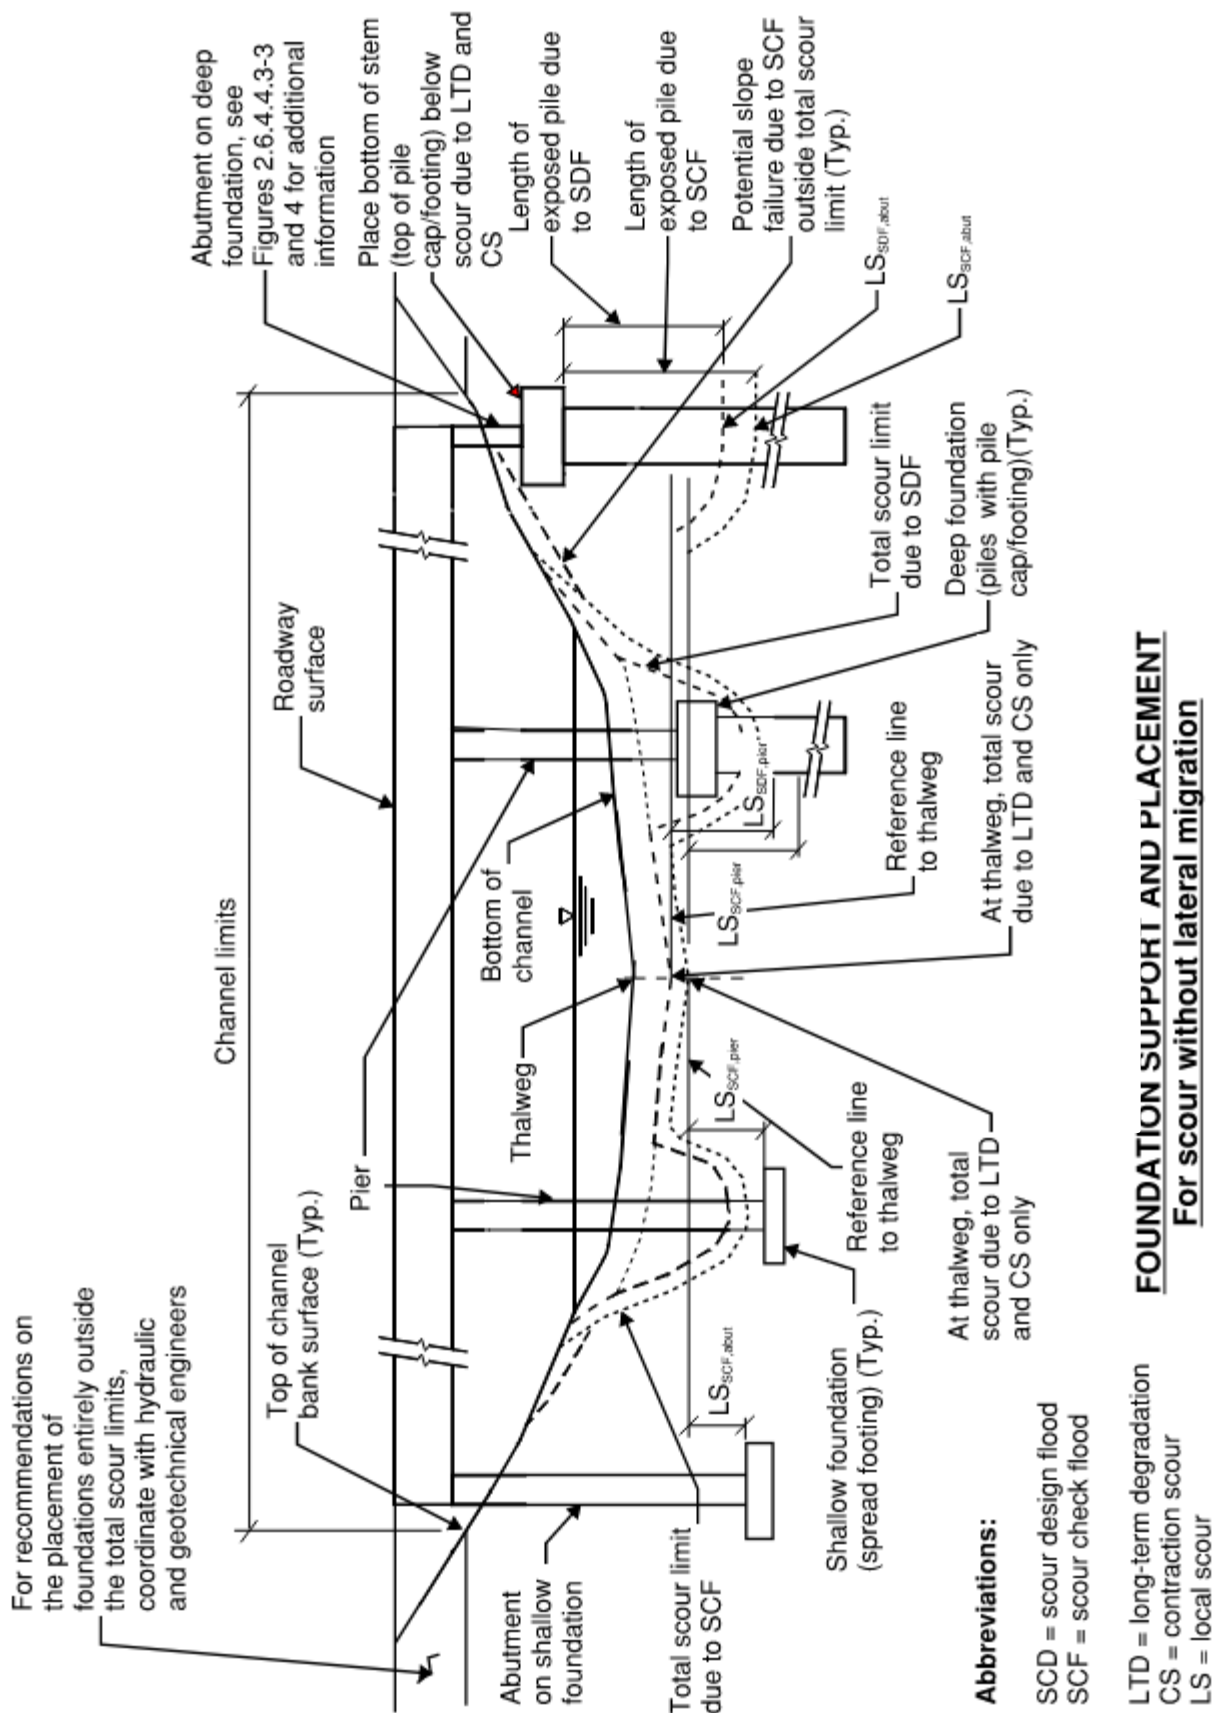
CT—Foundation Support and Placement for Scour Without Lateral Migration
